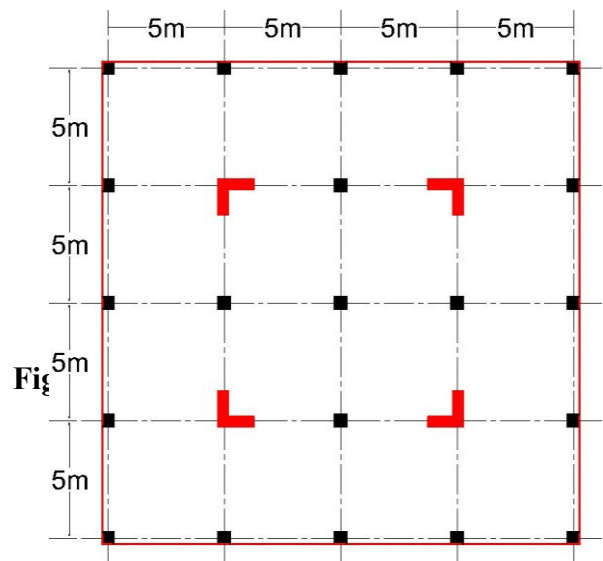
Floor plan of flat slab with drop panel and edge beam (MRF)
